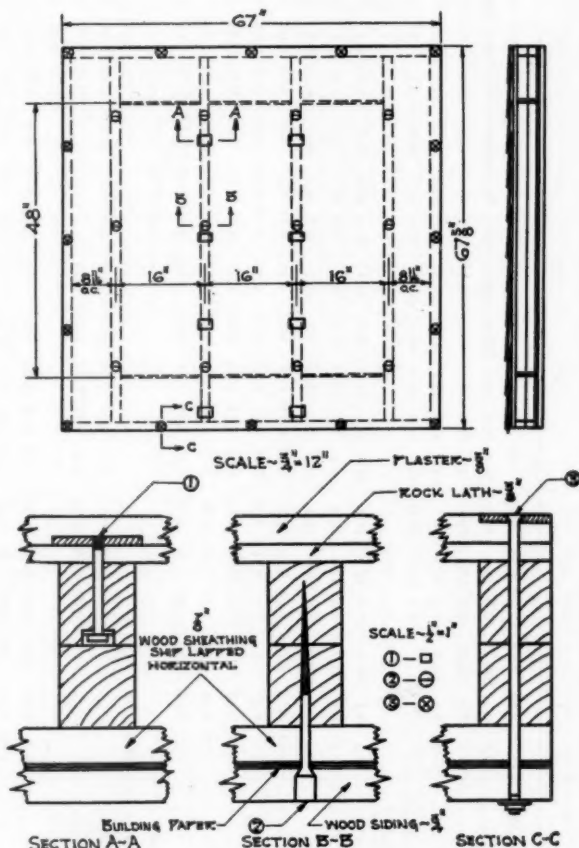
CONSTRUCTION OF WALL TEST PANEL
